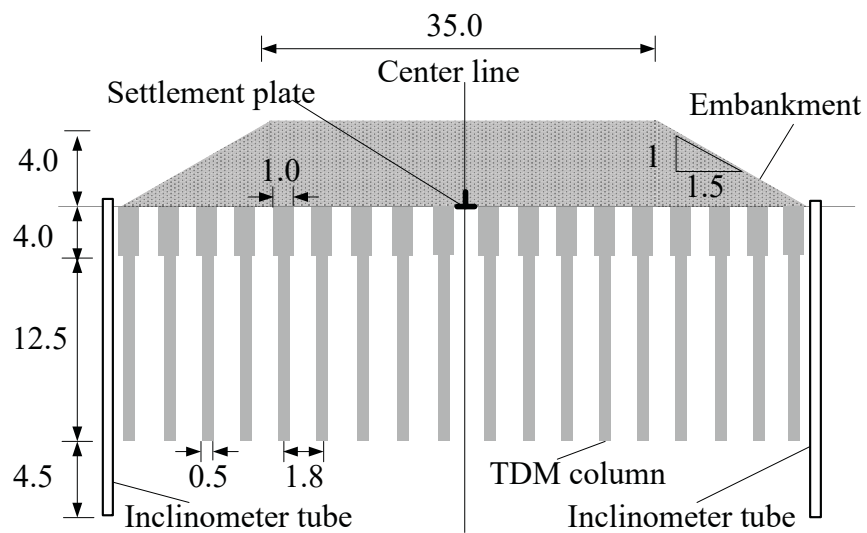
Geometry design parameters of TDM columns (unit: m) at test site.
